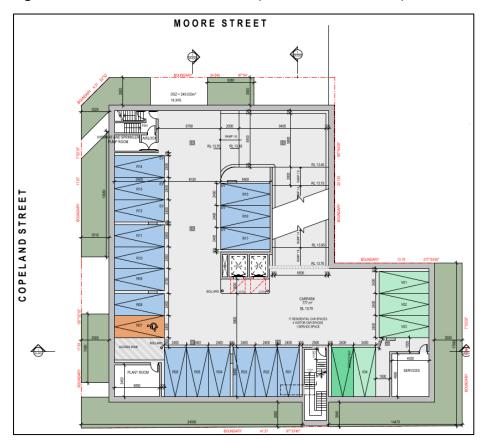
Basement Level 1 Plan Extract (Source: CDA Architects)
